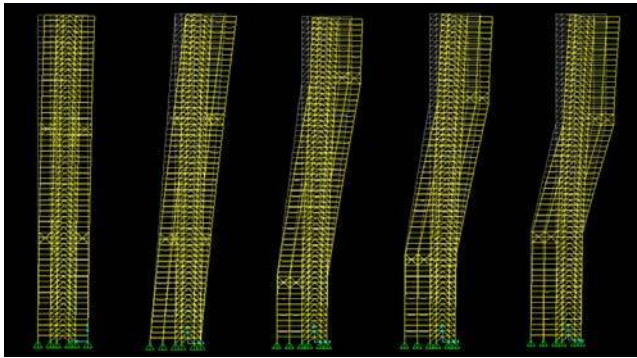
60-story tilted outrigger structures of various tilted angles (section view)
